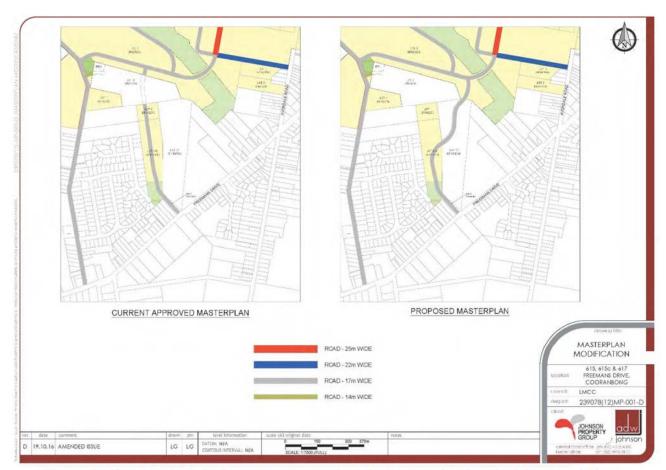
Comparison between approved and proposed extract of Concept Plan.
